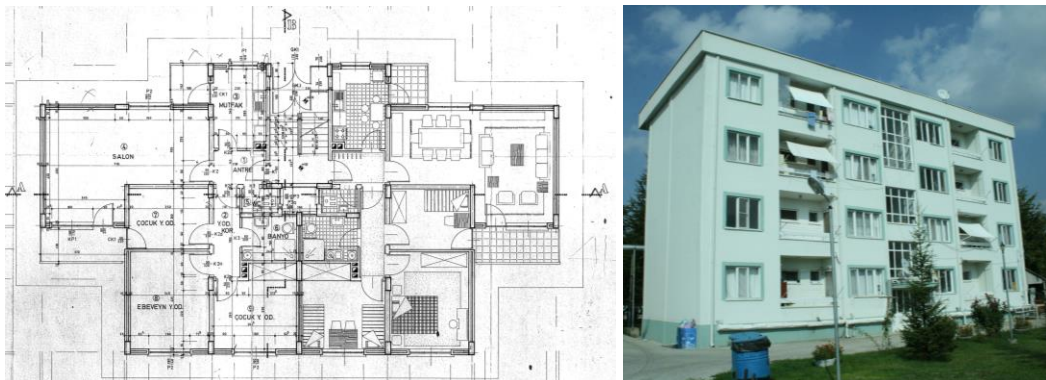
Floor plan drawn in 1975 and photo taken in 2014 of the apartments in the first block
